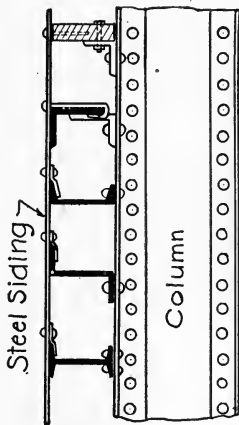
Methods of Connecting Corrugated Steel to Girts.
